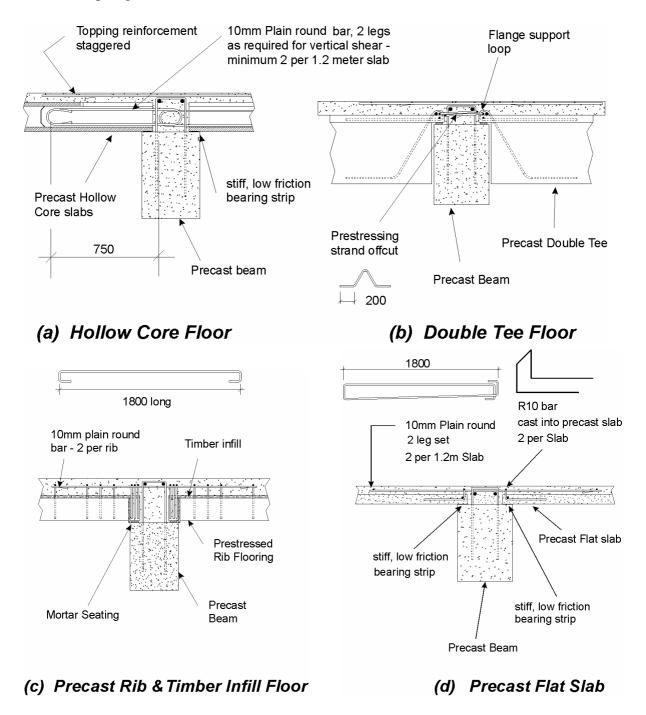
Details to prevent loss of support: (a) hollow core; (b) double tee; (c) rib; (d) flat slab (after McSaveney,1997).
